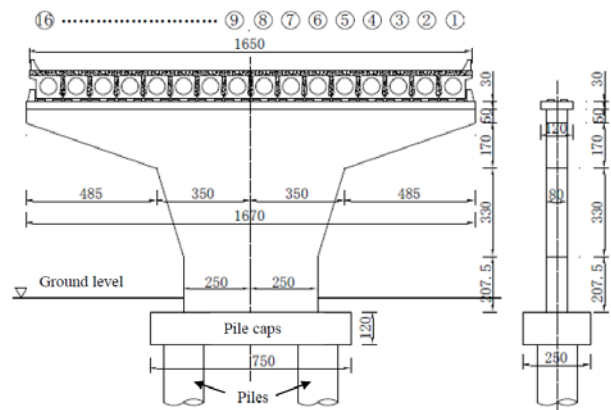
Numbering of the slabs and cross sections of the pier (unit: cm)
